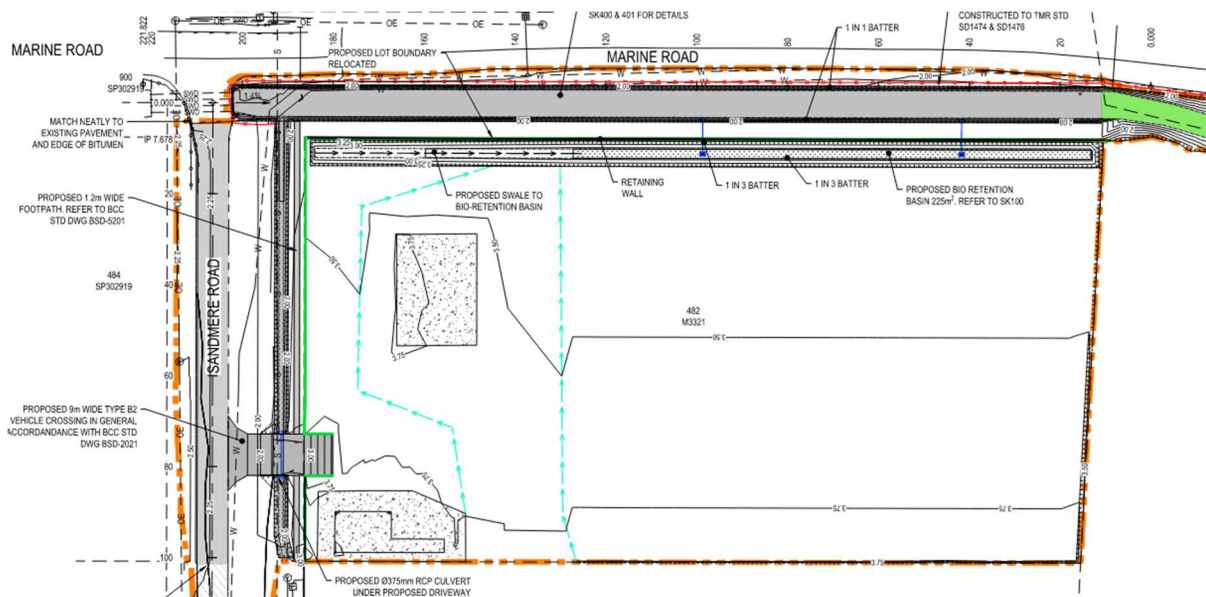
Proposed Changed Extent of Roadworks to Sandmere Road
